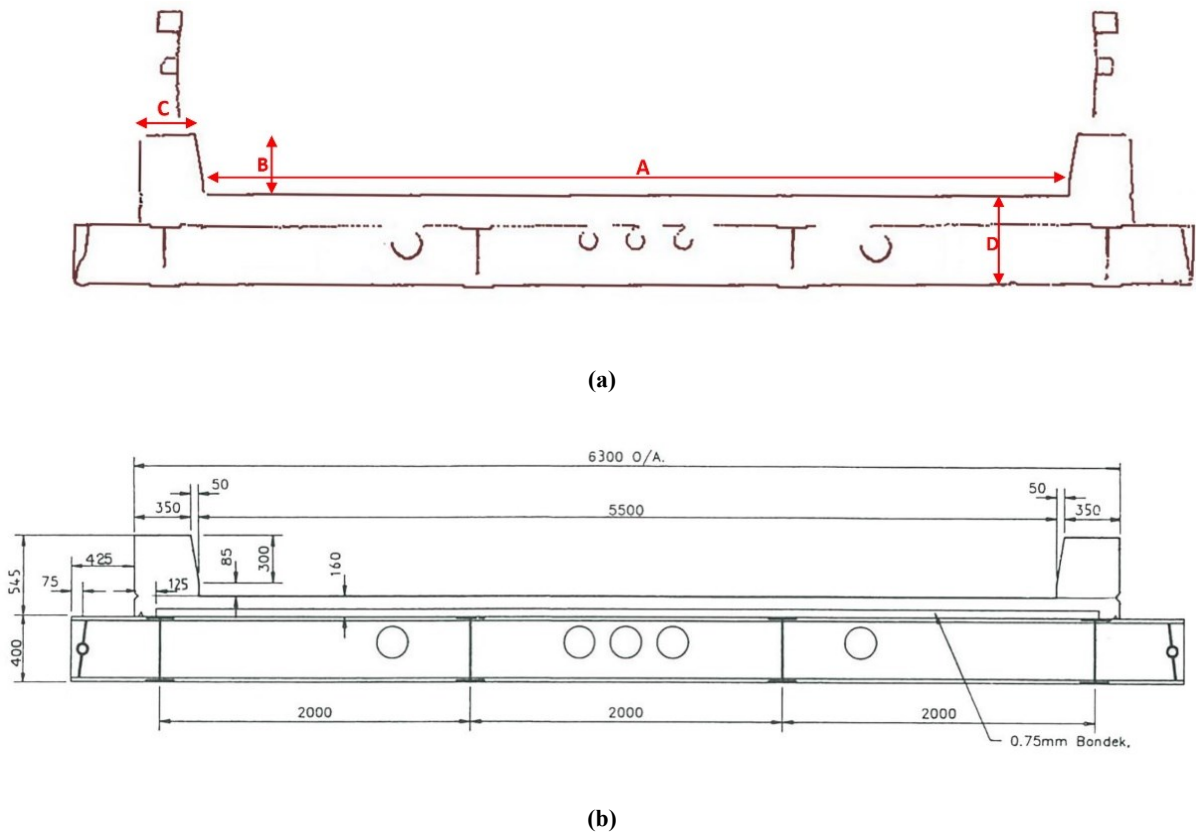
Geometrical parameters for distance measurement: (a) extracted cross-sectional profile of the bridge, (b) As-designed CAD drawing, Unit: mm.
